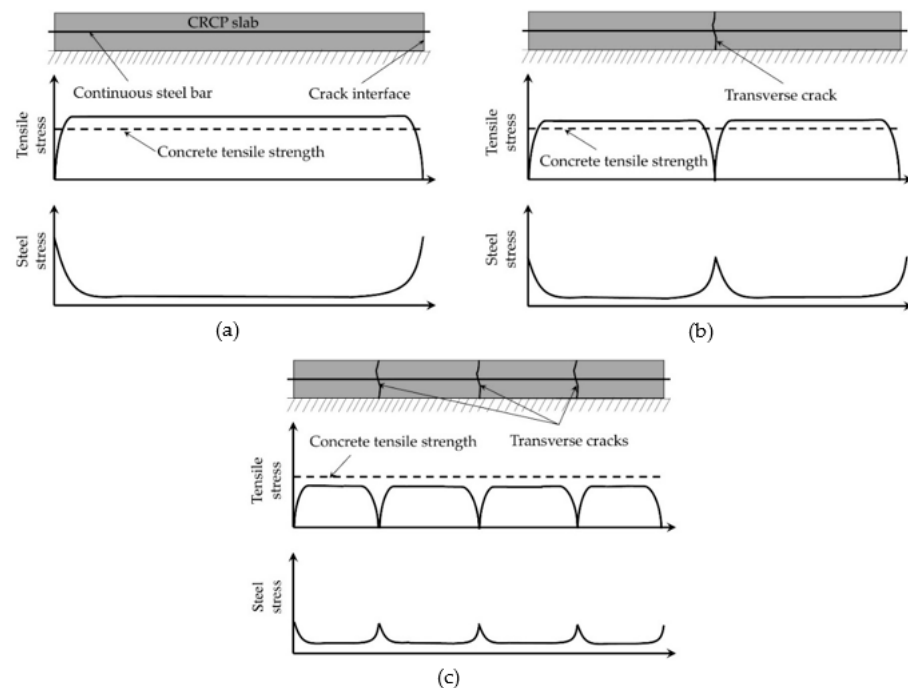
Cracking development in continuously reinforced concrete pavement (CRCP): (a) crack initiation; (b) crack propagation; and (c) fully developed crack pattern.
